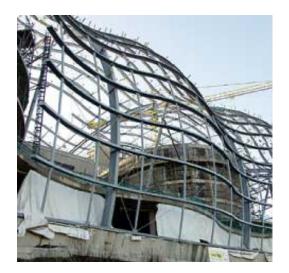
Frame of the outer skin of the sage building, on which cladding is mounted surrounding the concert halls
